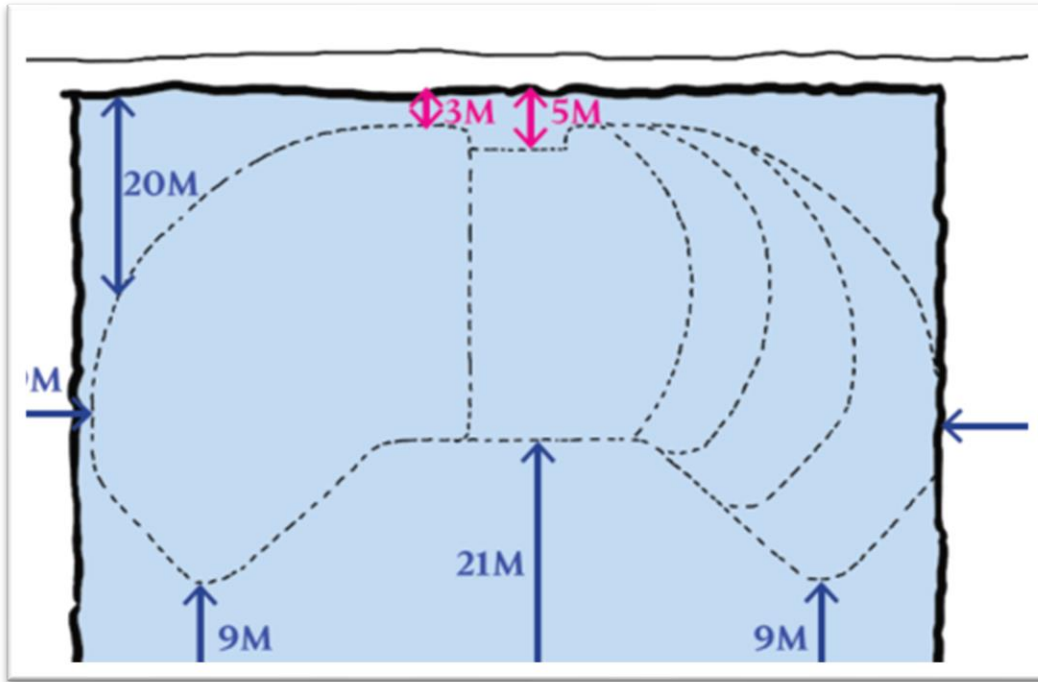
Proposed setbacks of Building B from Doonside Street. Source: Development Plan (Gurner 2023)
